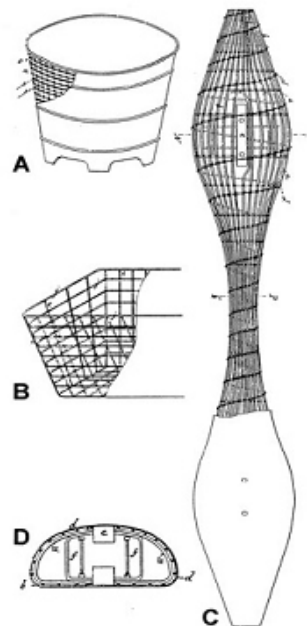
Drawings of Monier's patent specifications: containers for plants, railway sleeper [Gruber 2011]
